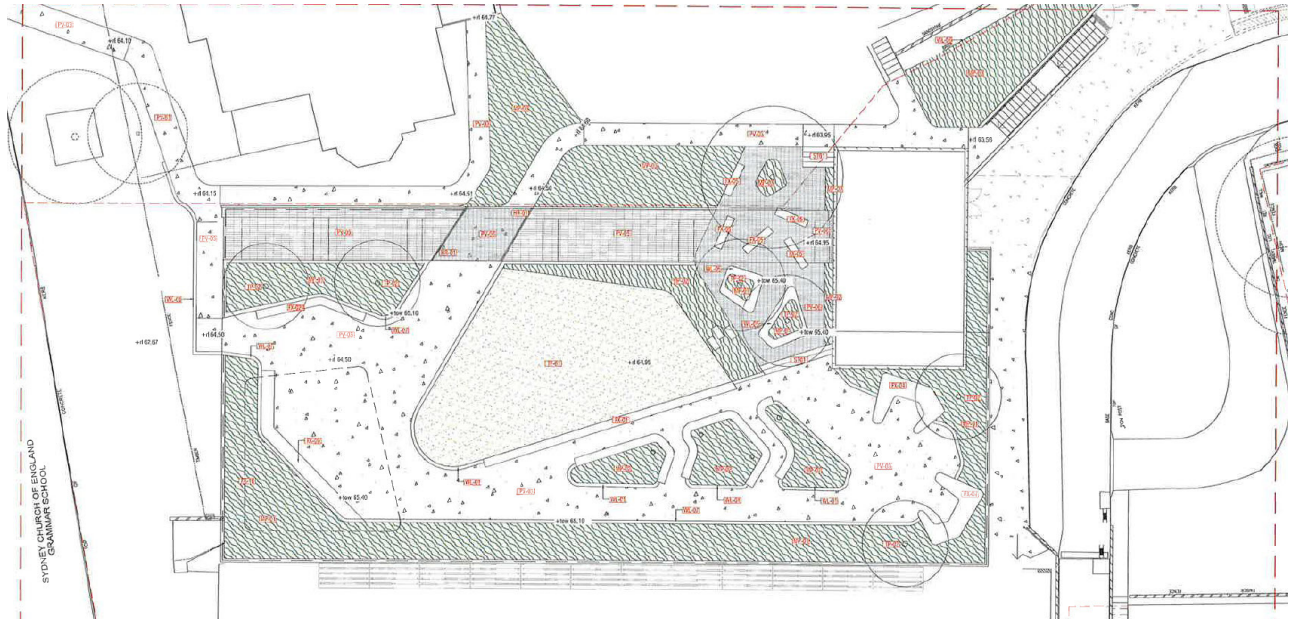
APPROVED General Arrangement Car Park Roof Top (Source: Stamped Plan, COX, LA-20-11, Revision 03)
